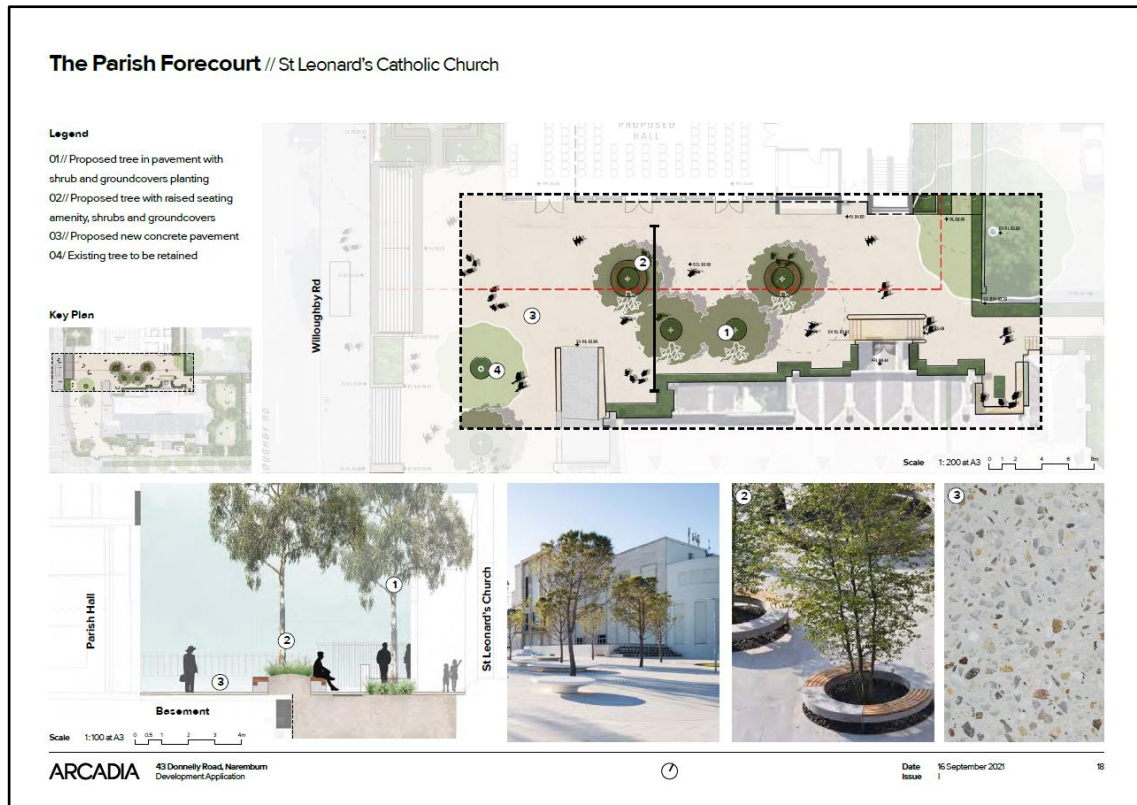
Proposed details and finishes of the proposed forecourt in between St Leonard's Catholic Church and new Parish hall.
